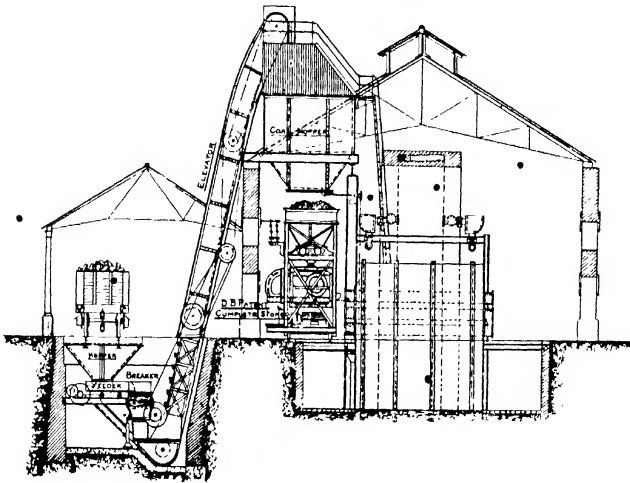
TYPICAL COAL-HANDLING PLANT BUILT BY W. J. JINKINS & CO., LTD.
